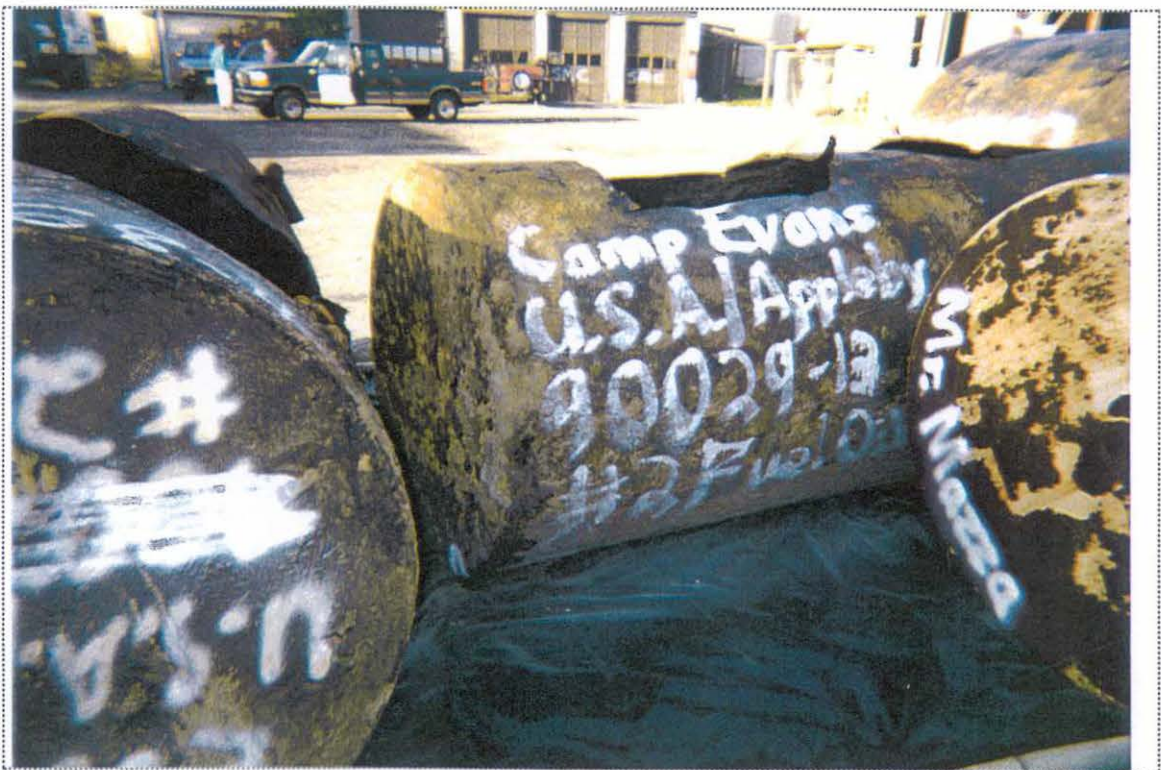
View of UST-9031 staged on the west side of Building 9061 awaiting disposal and labeled with all required information.
